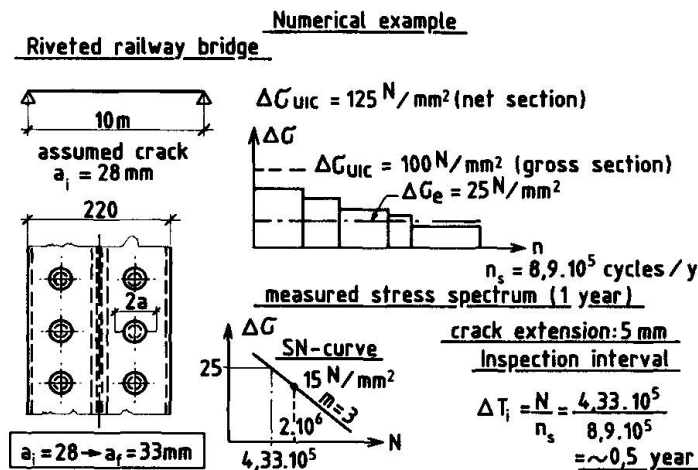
Example determination inspection interval of a riveted railway bridge.
